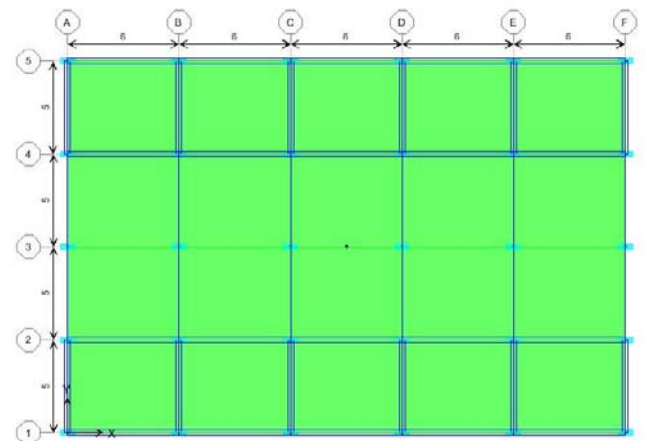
Masonry infilled core wall in adjacent bay in transverse y-direction and middle storey as soft storeys.
